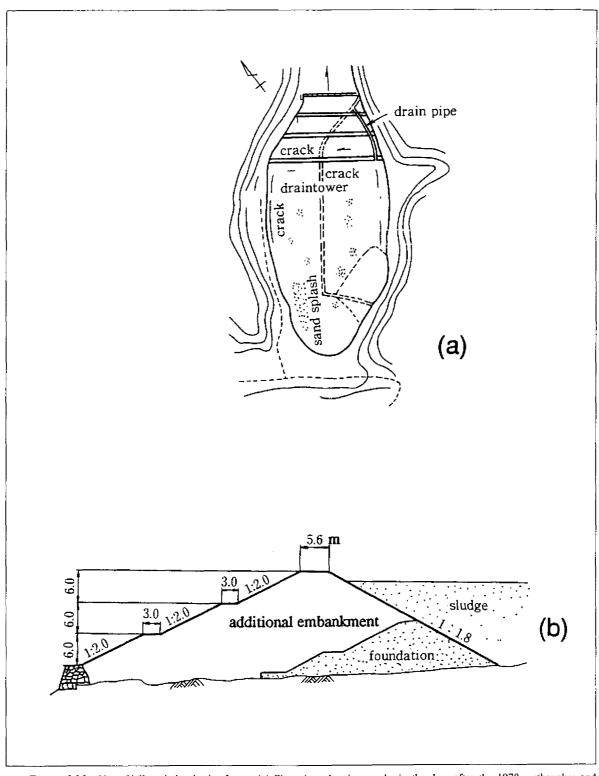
Noro Valley sludge basin, Japan: (a) Plan view showing cracks in the dam after the 1978 earthquake; and (b) Section through the dam.
